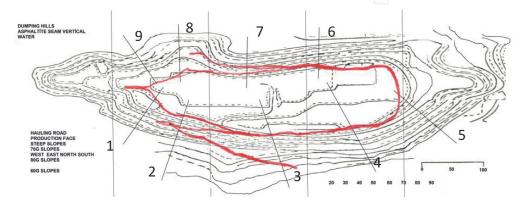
North and south steep slope faces of Avgamasya No. 1 pit of Şırnak asphaltite coal mine site and survey area with anchorage pattern.
